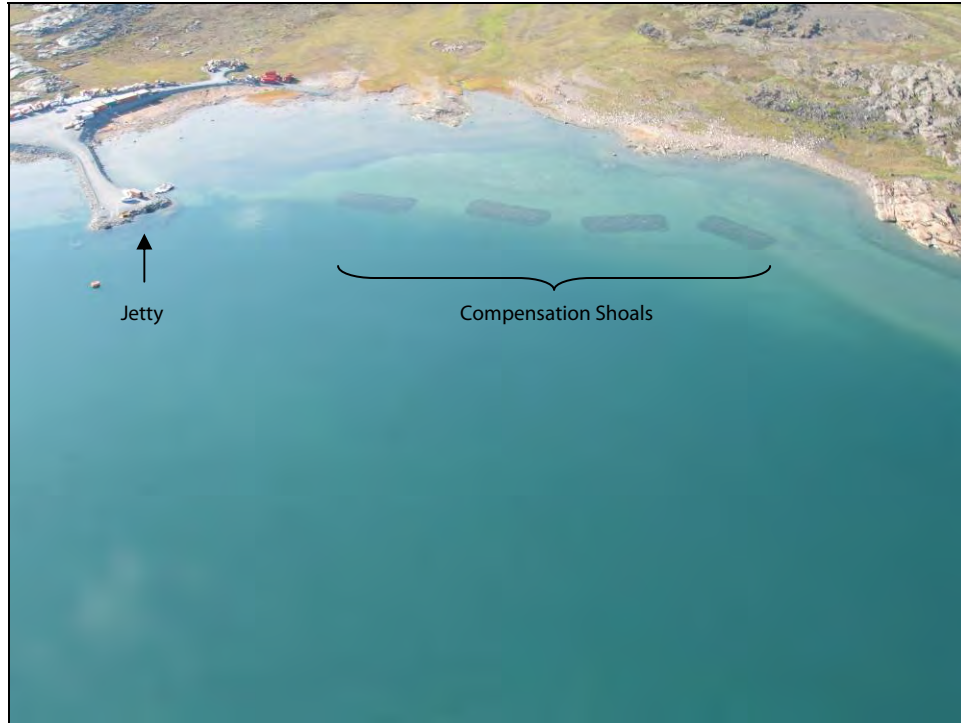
Aerial view of infrastructure (jetty) and compensation shoals in Roberts Bay, Hope Bay Belt Project. View is looking south.
